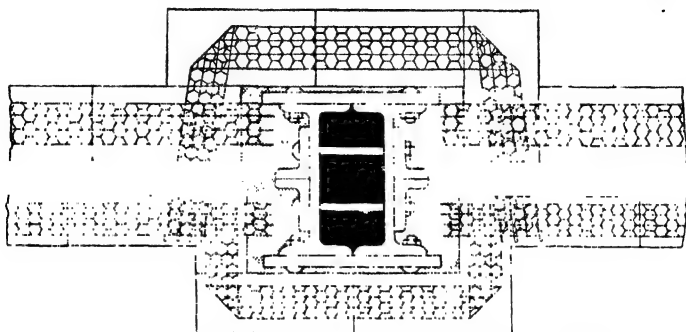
Reinforced Brickwork Walls. (Brown System.)
